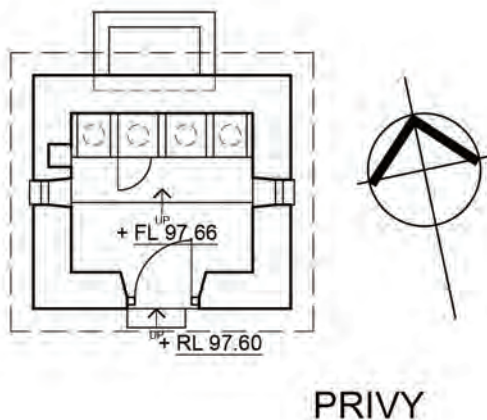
234: Measured floor plan of Privy. Source: LSJ Architects.
